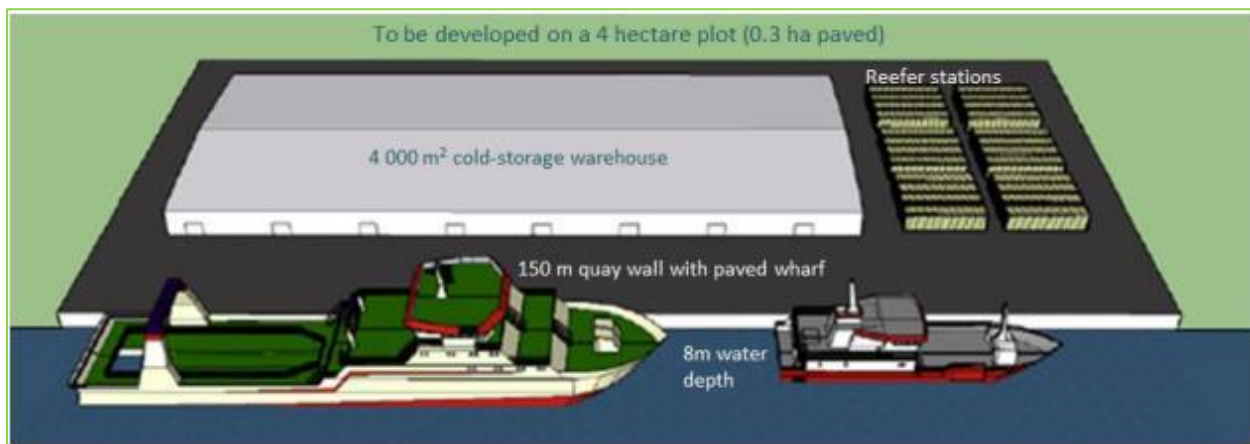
Conceptual design for the development of Shimoni industrial fishing Port (Source: KPA Master plan, 2019).
